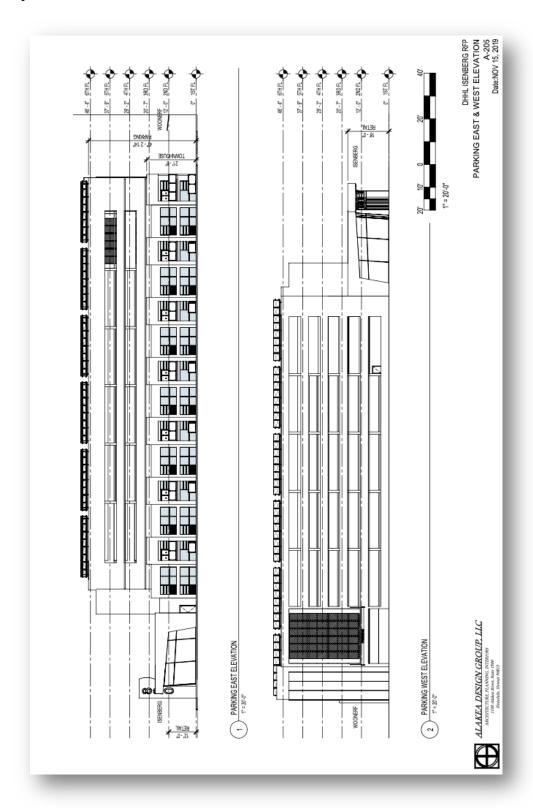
Parking East/West Elevations Source: SCD Development and Alakea Design Group
